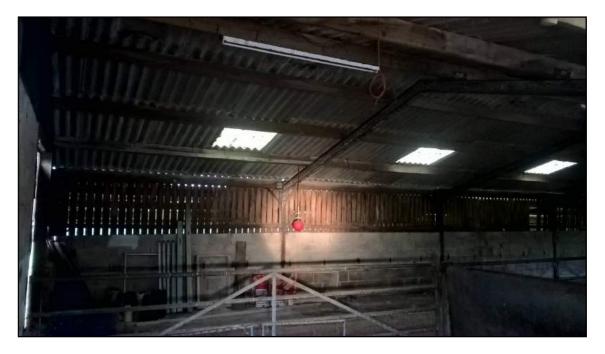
Interior of Building 3 showing open structure and corrugated roof
